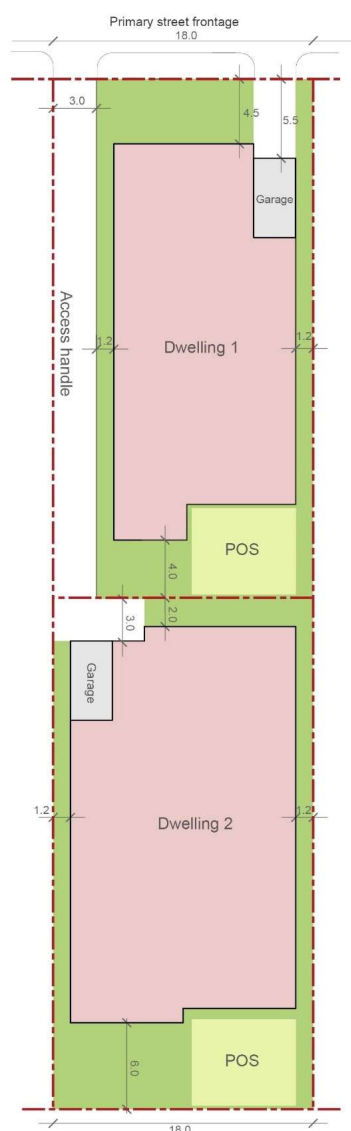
Detached dual occupancy in a battle axe configuration. Note: all dimensions are in metres.
